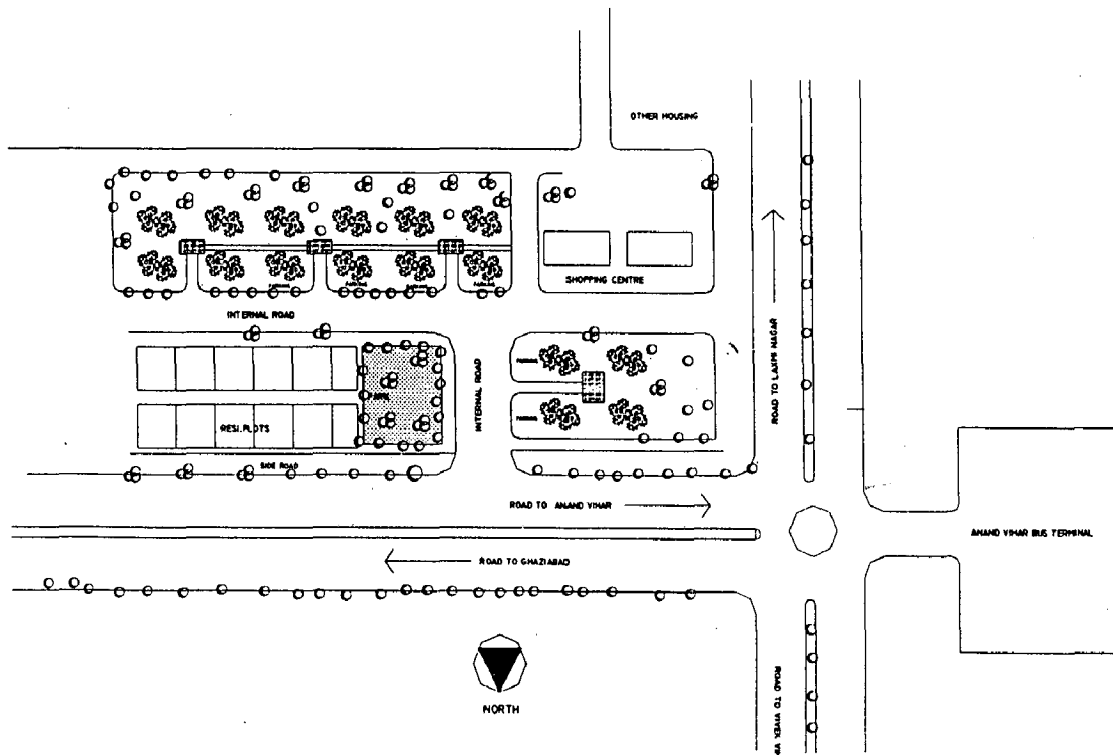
SITE PLAN KAUSHAMBHI
